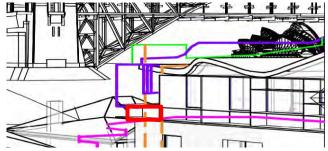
Proposed view from Unit 10/ 21 Waiwera Street
